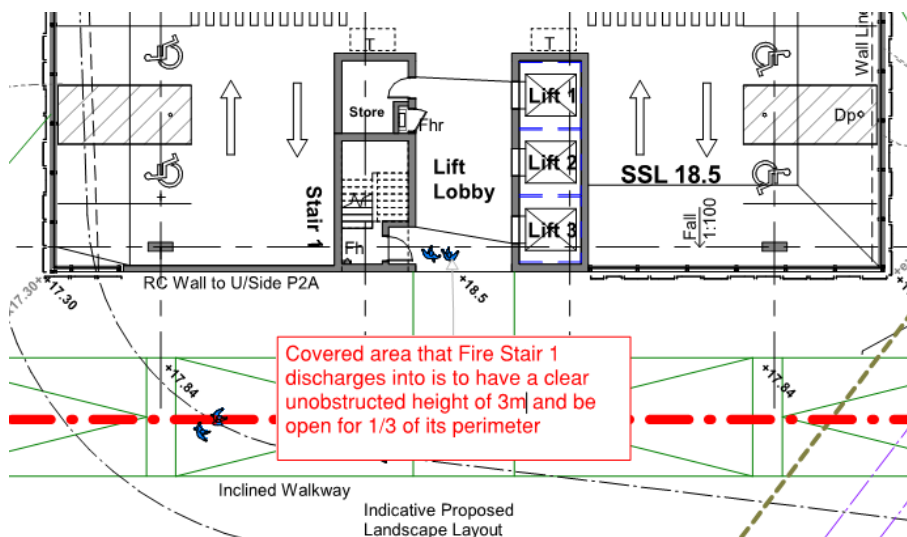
Discharge from Fire Stair 1 into a covered area adjoining open space
